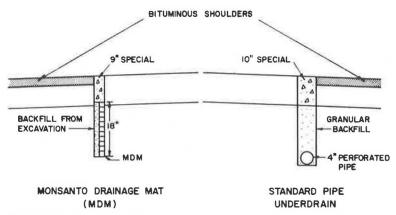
Details of Monsanto drainage mat and standard pipe underdrains.
